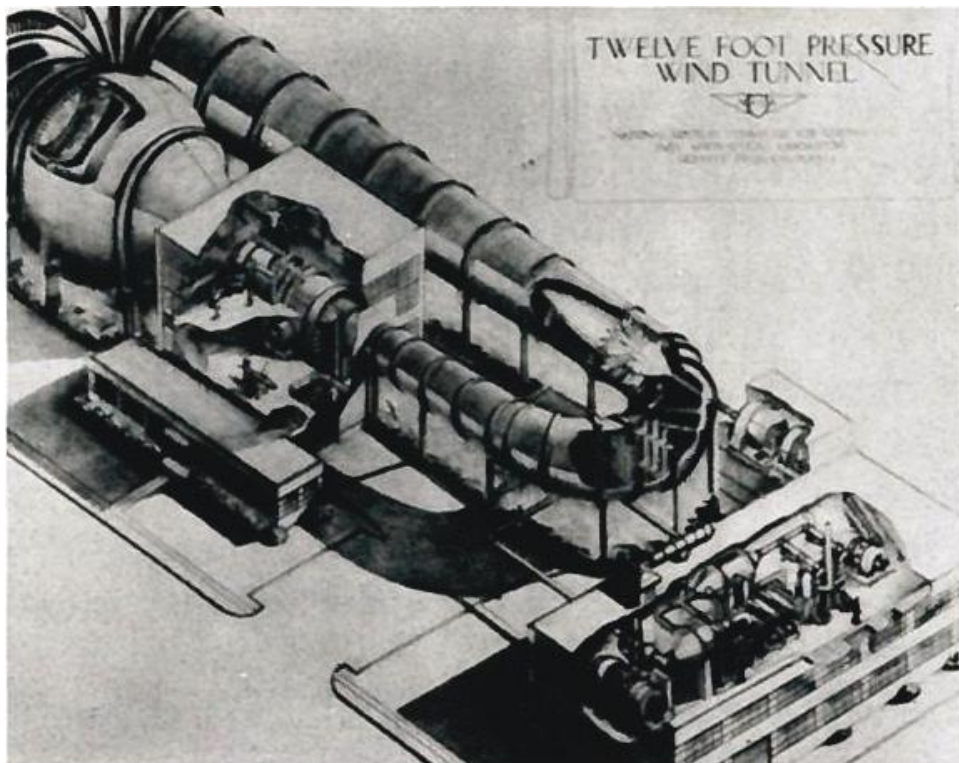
Cutaway drawing, Building N206A at bottom right. (Source: Hartman 1970)
